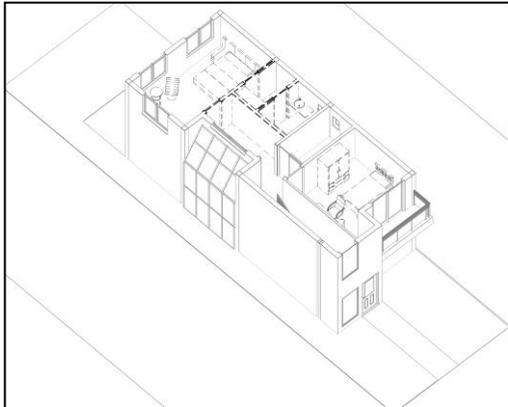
First floor 3D plan in stage three – dashed lines show demolished elements
